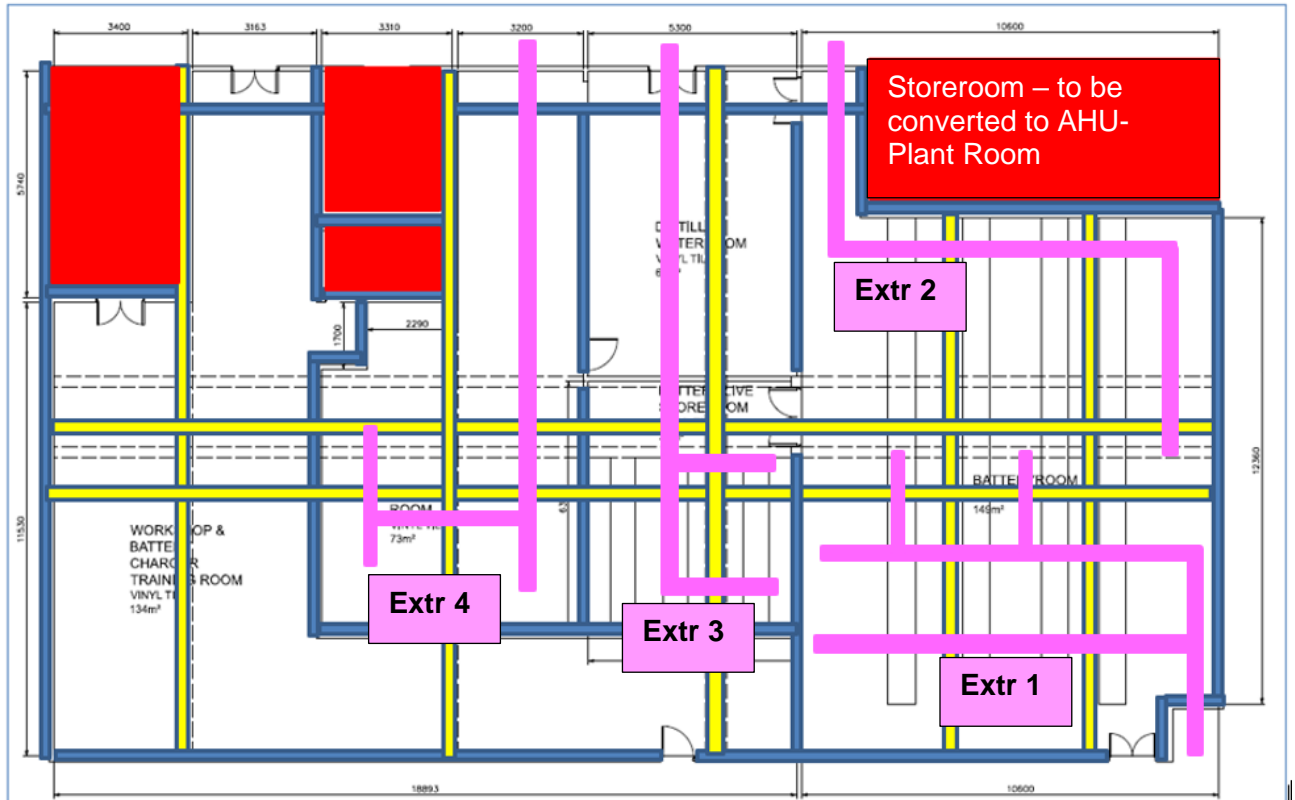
Extraction System – Ductwork layout – 4x off systems (Pink)
